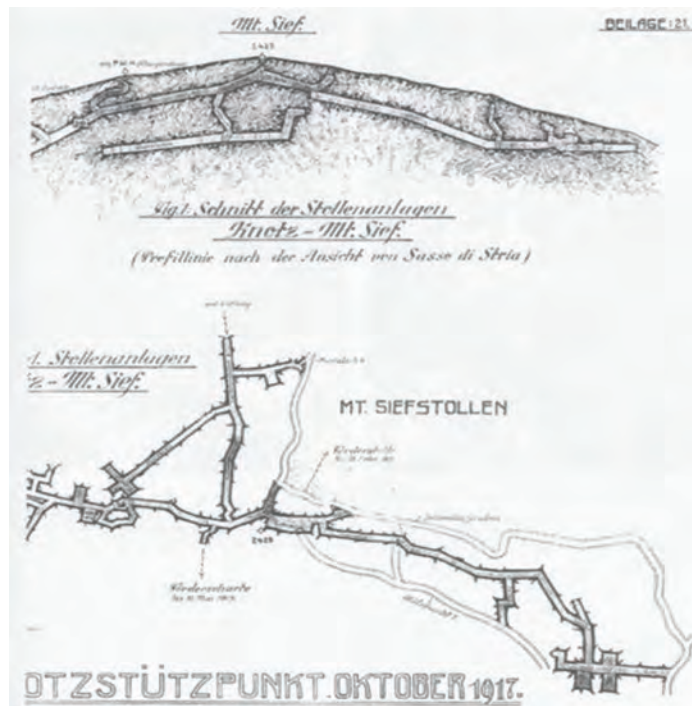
An Austrian tunnel under the Monte Sief summit[33].
